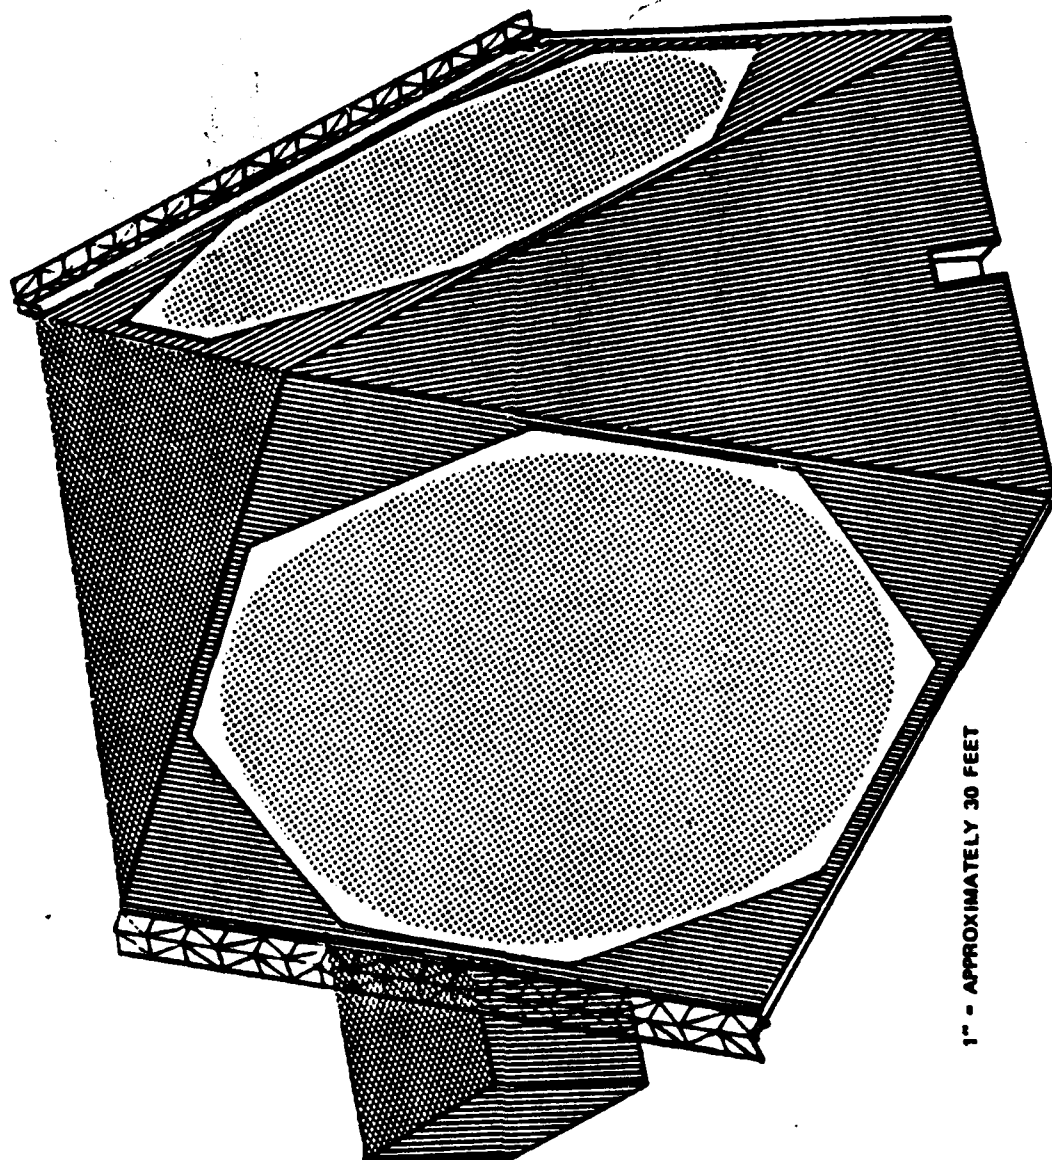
PAVE PAWS RADAR AND POWER PLANT BUILDINGS
